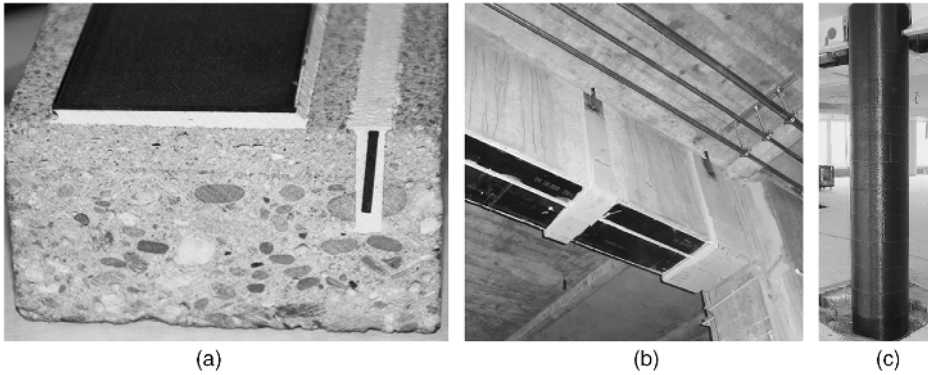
(a) Externally bonded and near-surface-mounted CFRP strips; (b) flexural strengthening with externally bonded CFRP strips together with shear strengthening in the form of externally bonded steel plates (photo: Laumer Bautechnik GmbH); (c) column strengthening with CF sheets as confining reinforcement (photo: Laumer Bautechnik GmbH)
